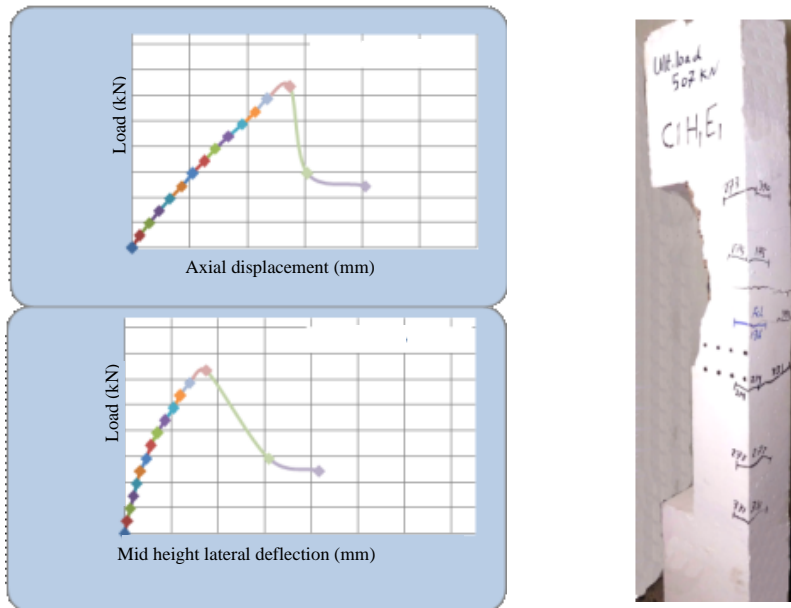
a) Load-deflection of specimen C_1 and b) Crack pattern of C_1
